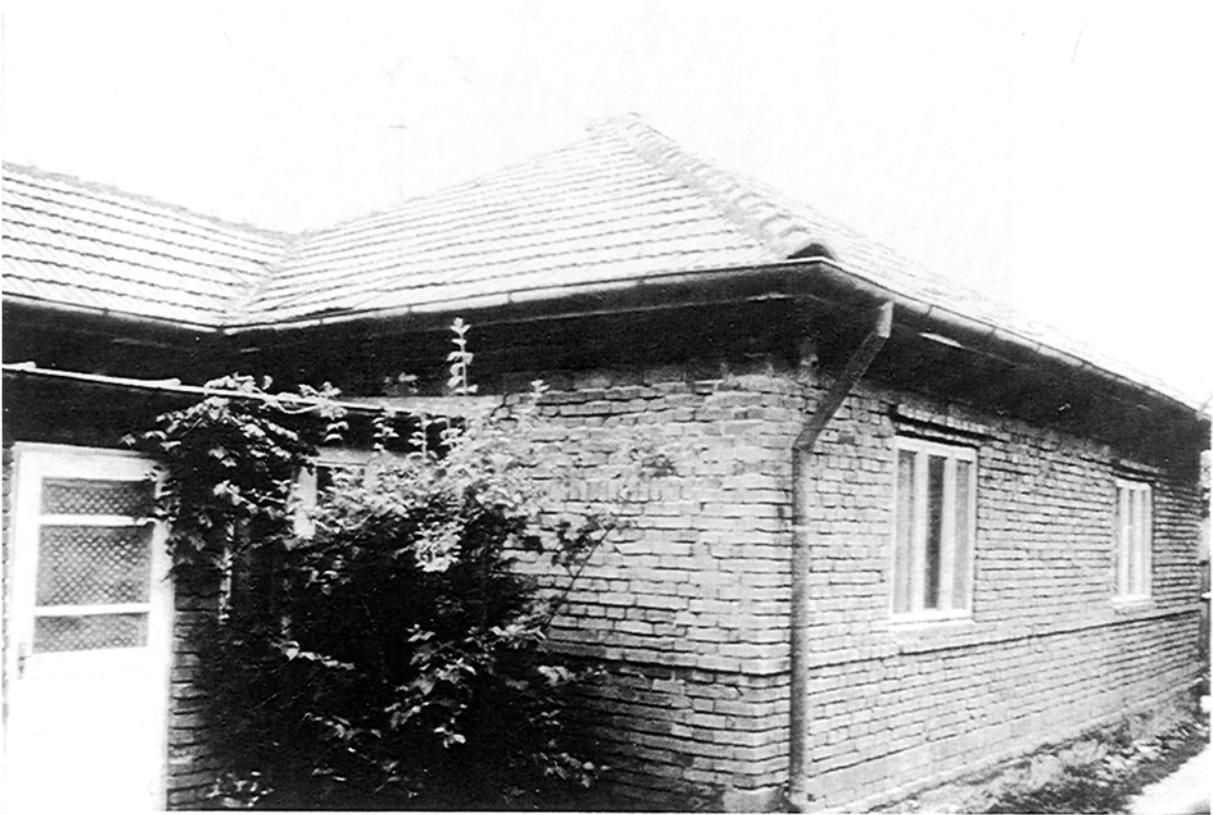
Typical single storey unreinforced brick masonry in cement-lime mortar.
